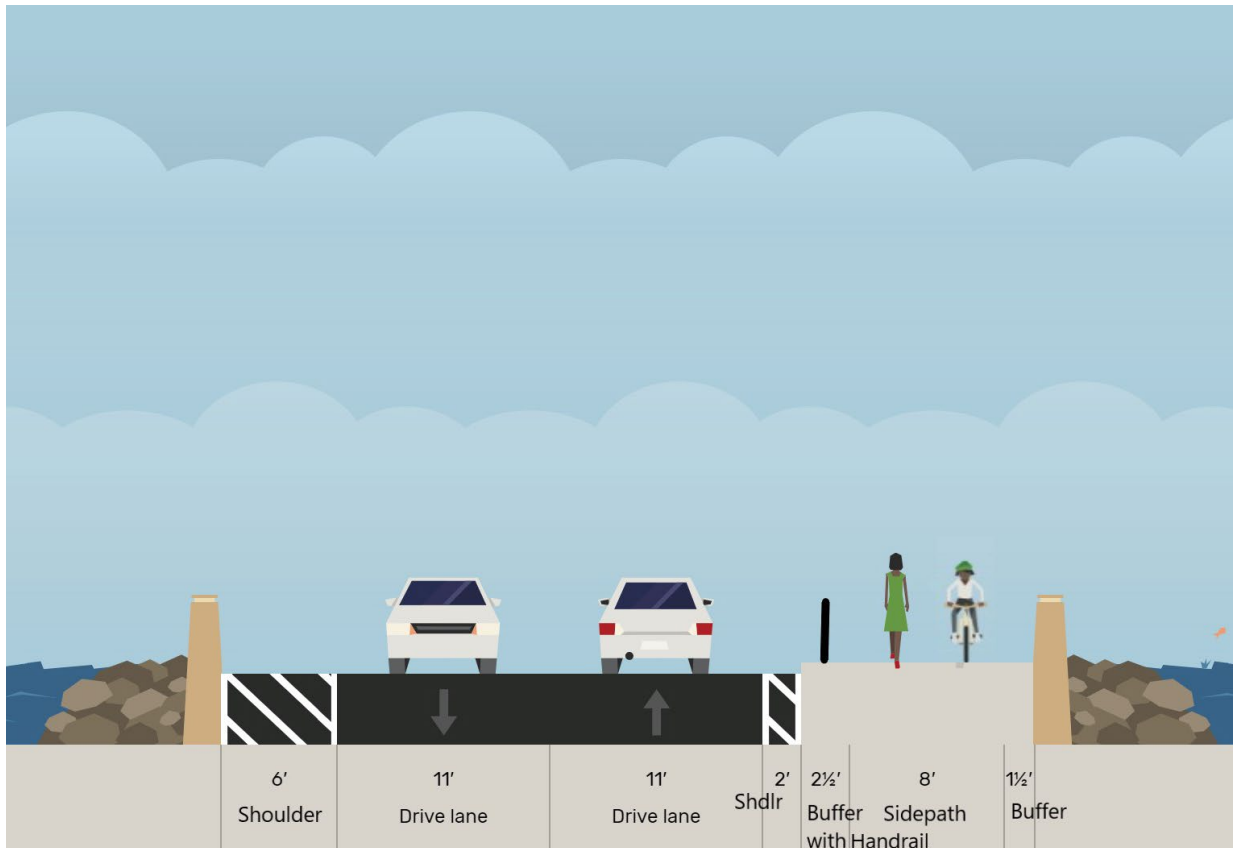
Recommended Bridge Cross Section with Master Plan Vision
